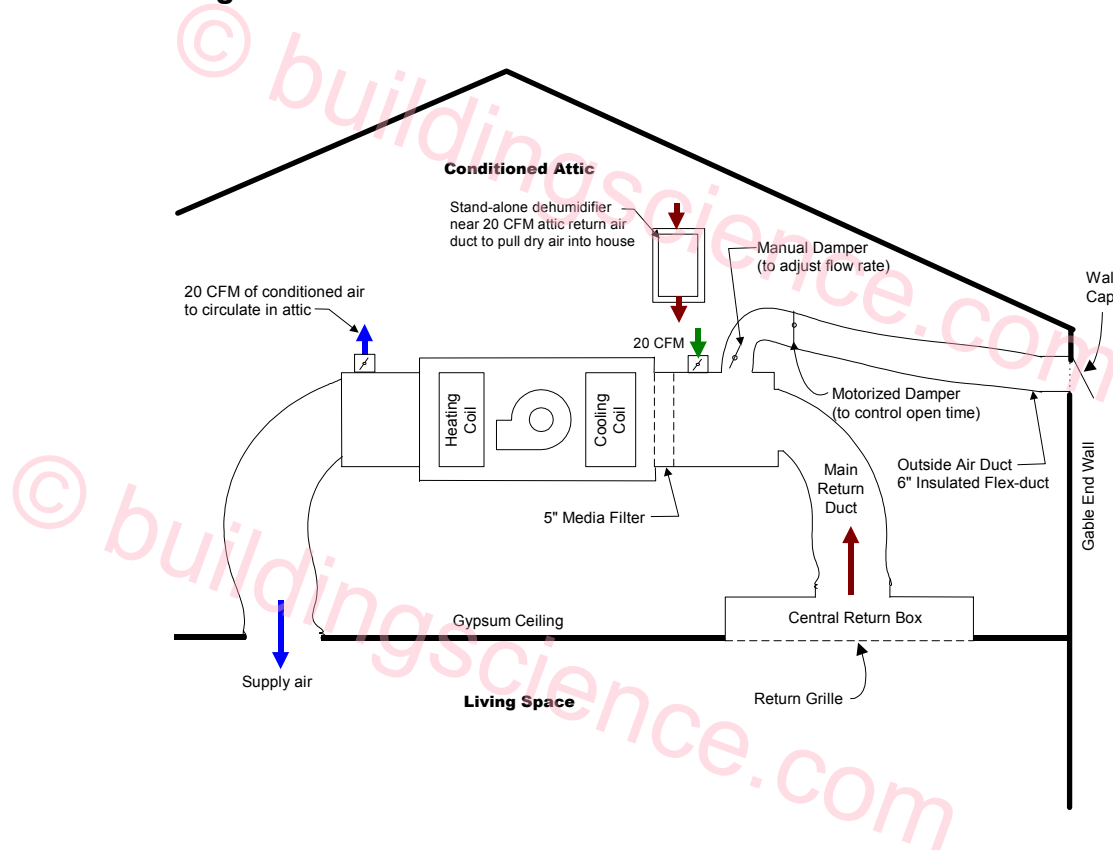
Schematic of stand-alone dehumidifier in conditioned attic system; dry air is delivered to the house via a small attic return duct placed near dehumidifier; ventilation is by central-fan-integrated supply as in all the standard Building America houses
